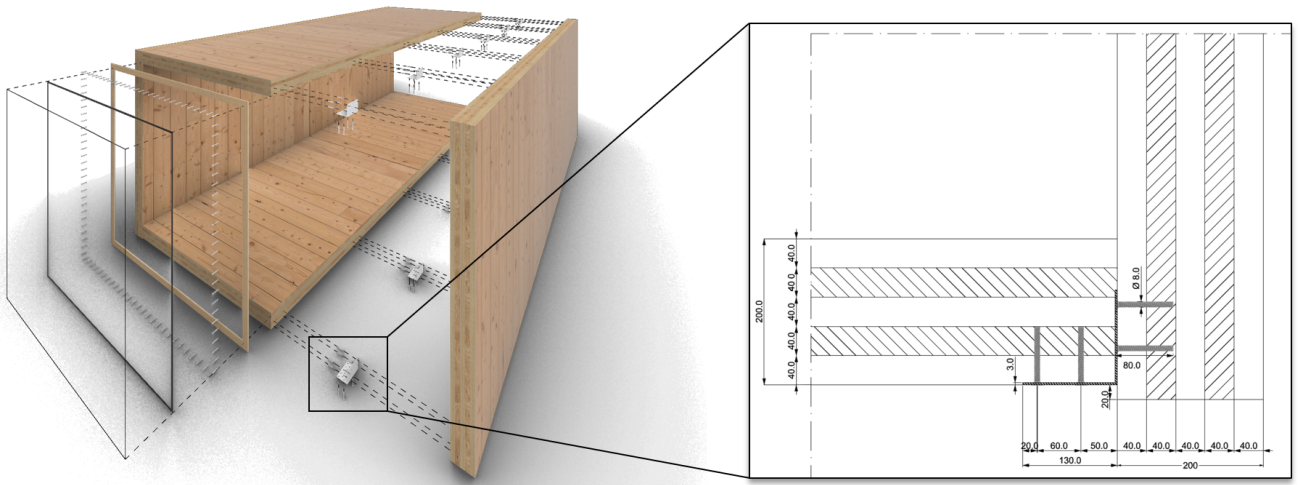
Exploded view of the timber modules and steel bracket detail
